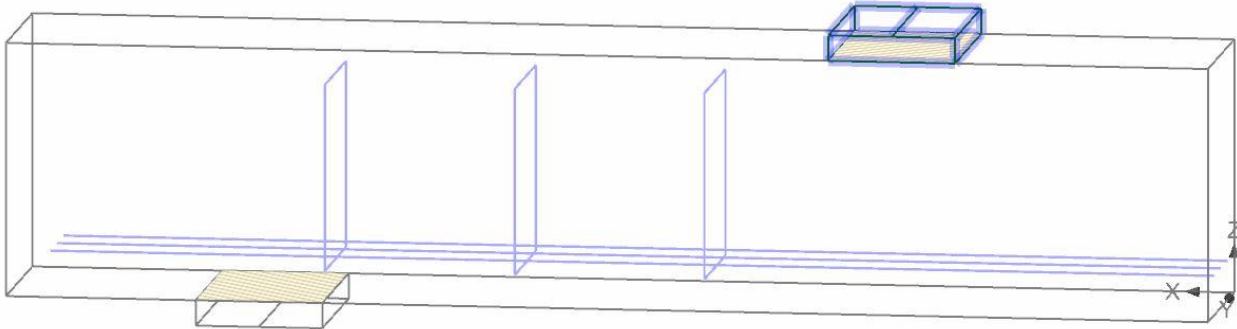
ATENA model of Reinforced Concrete Beam with 31mm Reinforcement cover.
